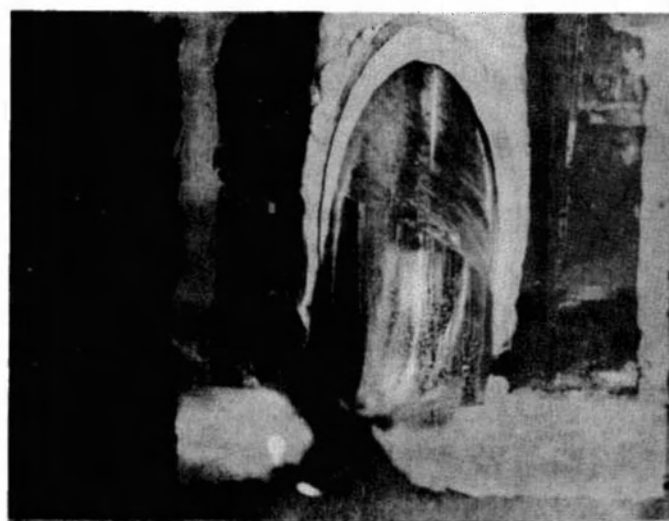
AIR FLOW INTO CULVERT FROM OUTLET
